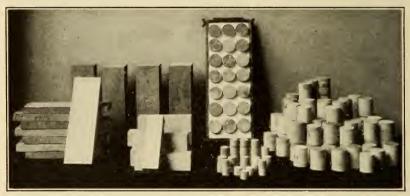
Specimens ready for testing, and group of cylindrical specimens in the plaster cast at center
